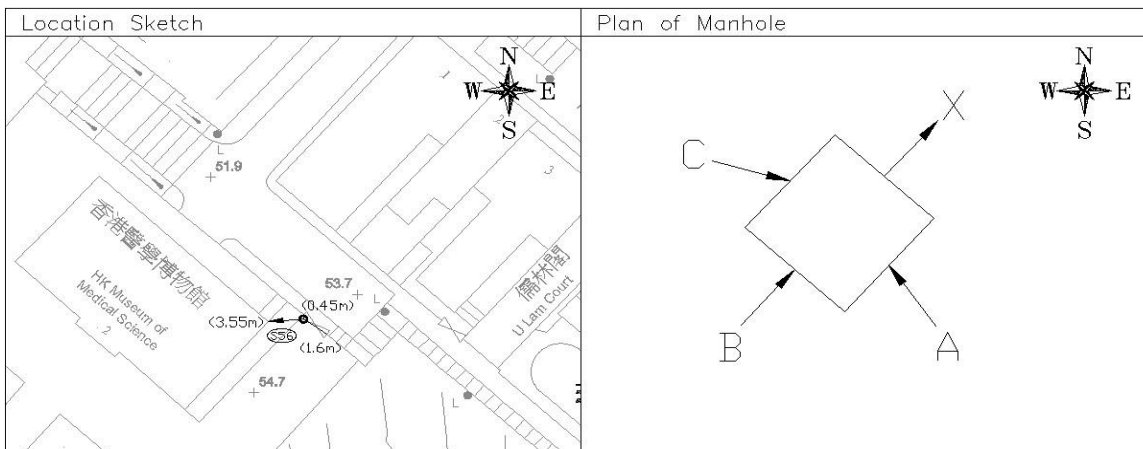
Location Sketch and Plan of Manhole in Manhole Record Card.
